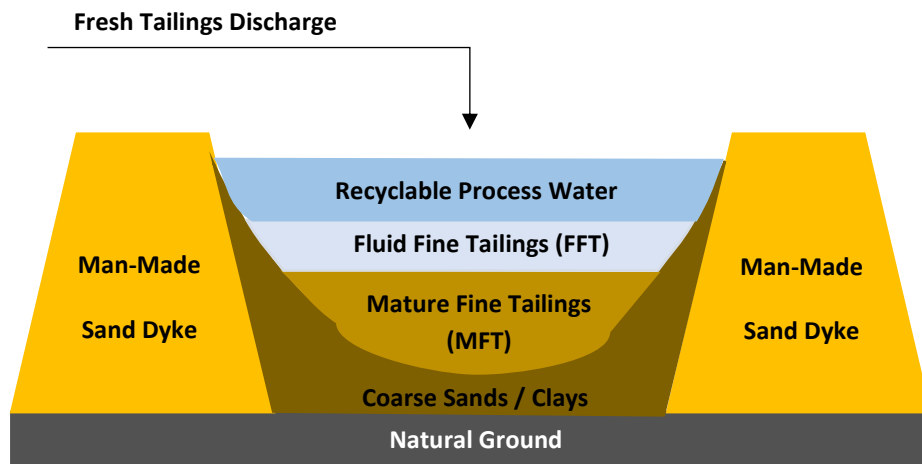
Theoretical tailings pond cross-section (adapted from [20]).
